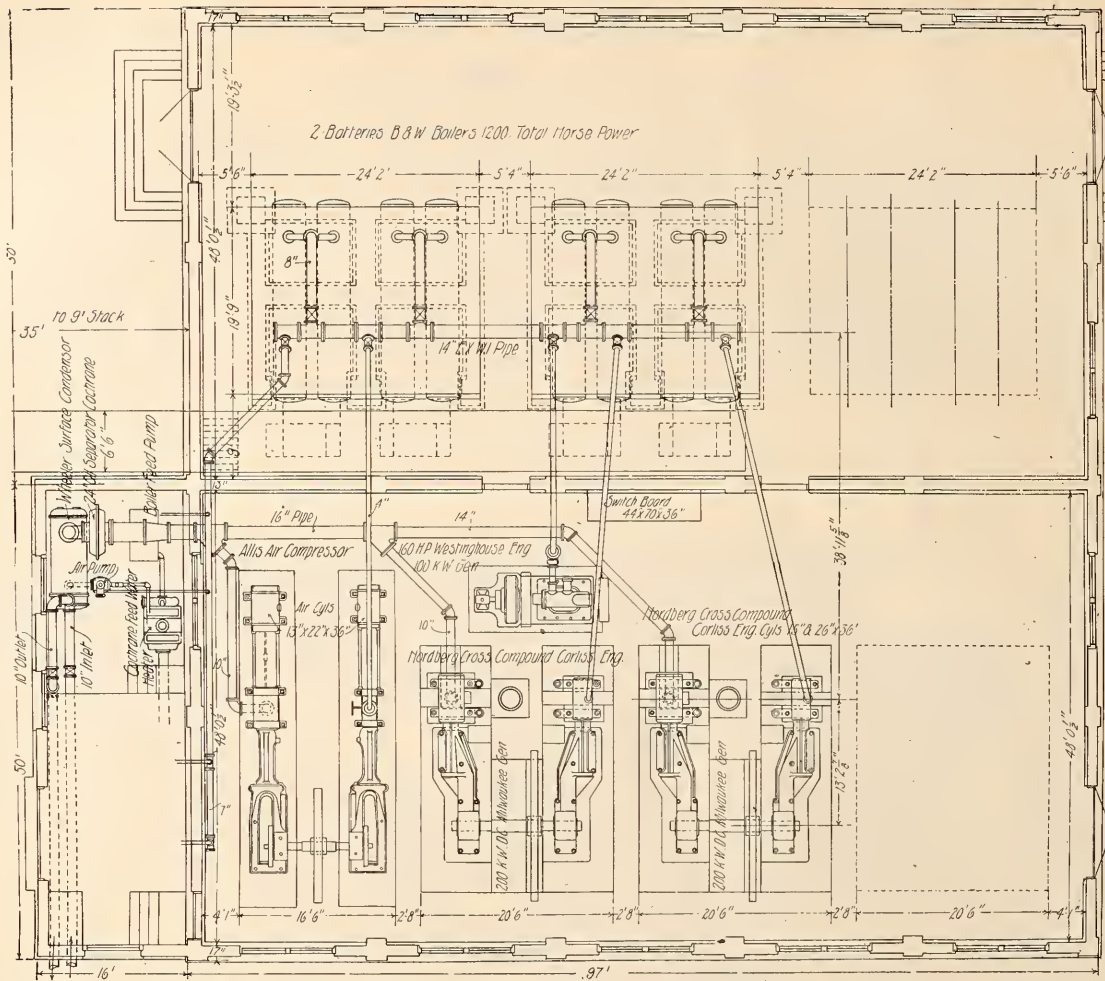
PLAN OF POWER HOUSE, C., M. & ST. P. RY.
